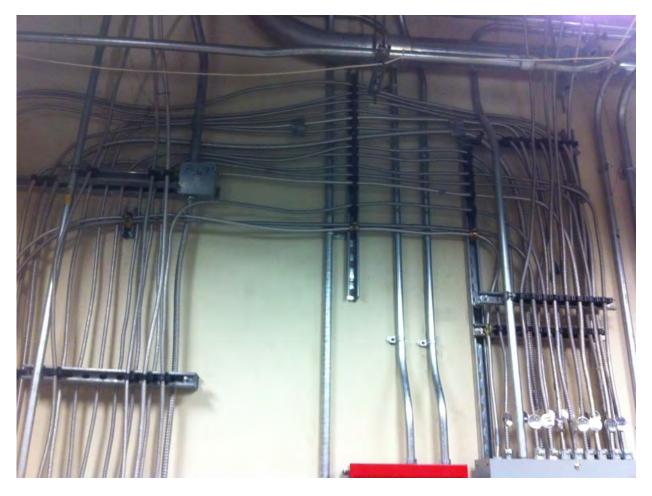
Power Conduit transition to Armored Flex Cables leading to AFC Panel (Electrical Room 110)
